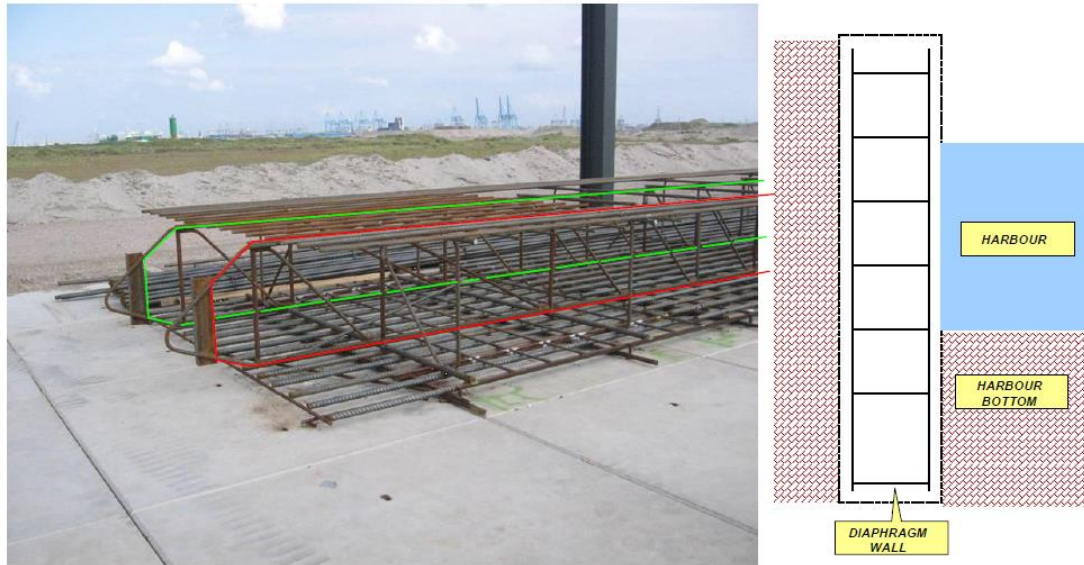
Reinforcing on the diaphragm wall, (left) indicating the two measurement lines in red and green and (right) the reinforcing placed within the diaphragm wall
